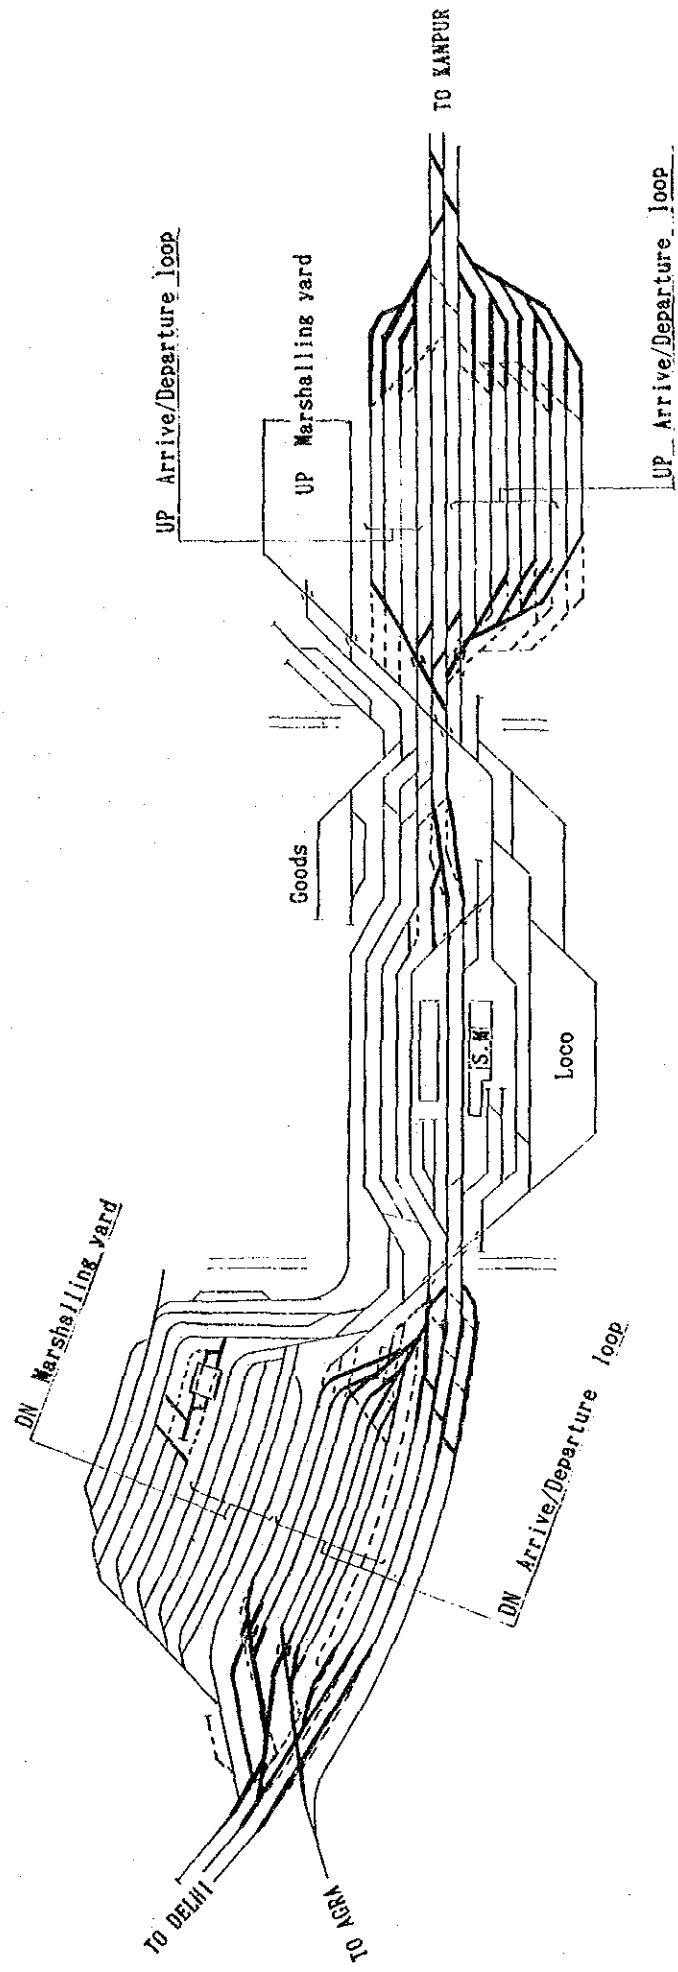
Tundla Station Yard Improvement Plan
